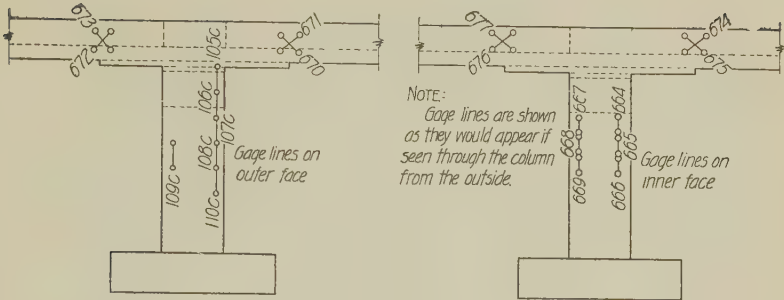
LOCATION OF GAGE LINES ON COLUMNS AND MARGINAL BEAMS OF SLAB J.
